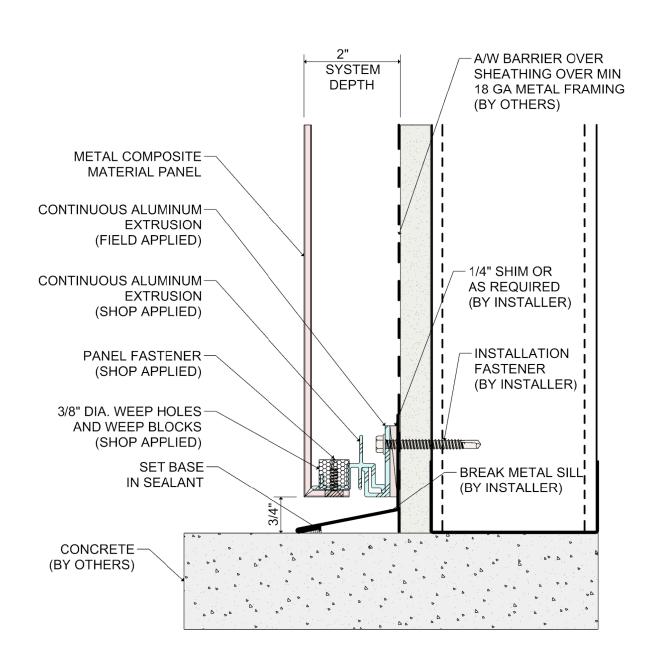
RAINSCREEN SYSTEM
